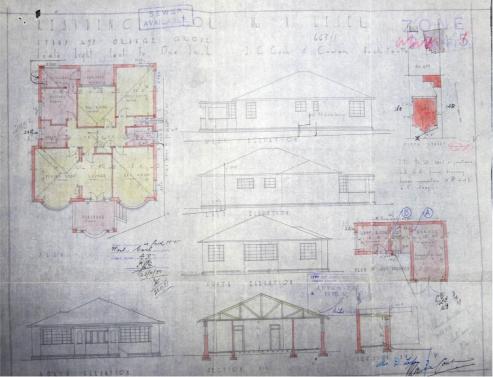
Plan for proposed residence on Stand 459, Orange Grove from 1937 Good example of three bedroomed single storey residence with corrugated iron roofing and centrally located front stoep
